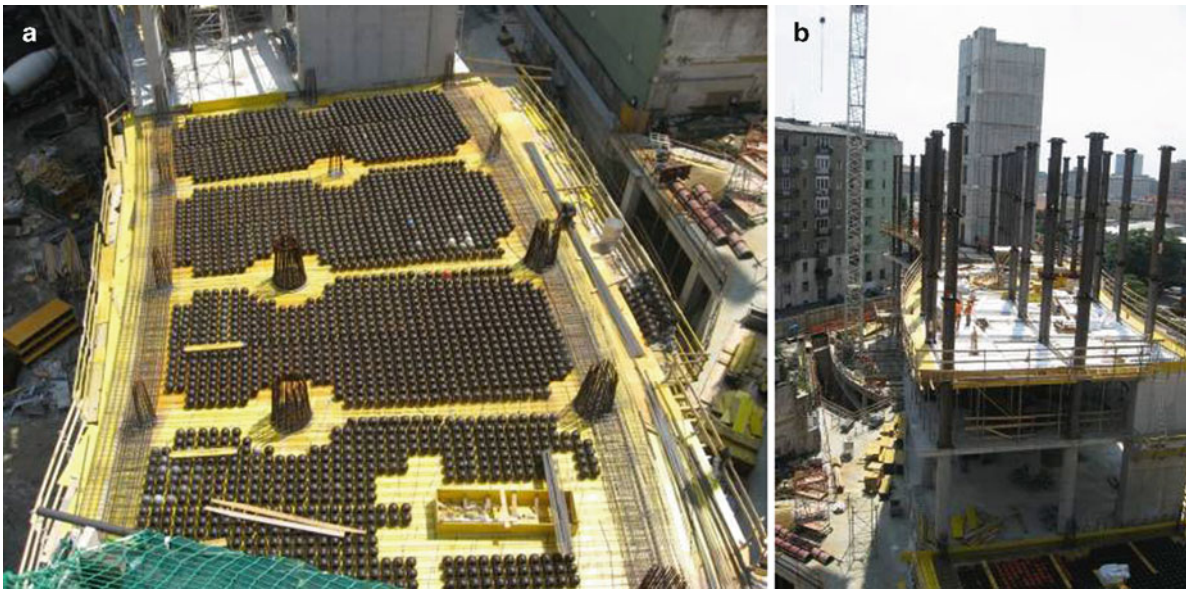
Structural details: (a) ‘bubbledecks’ in Core 1, (b) steel encasing for columns of Core 1
